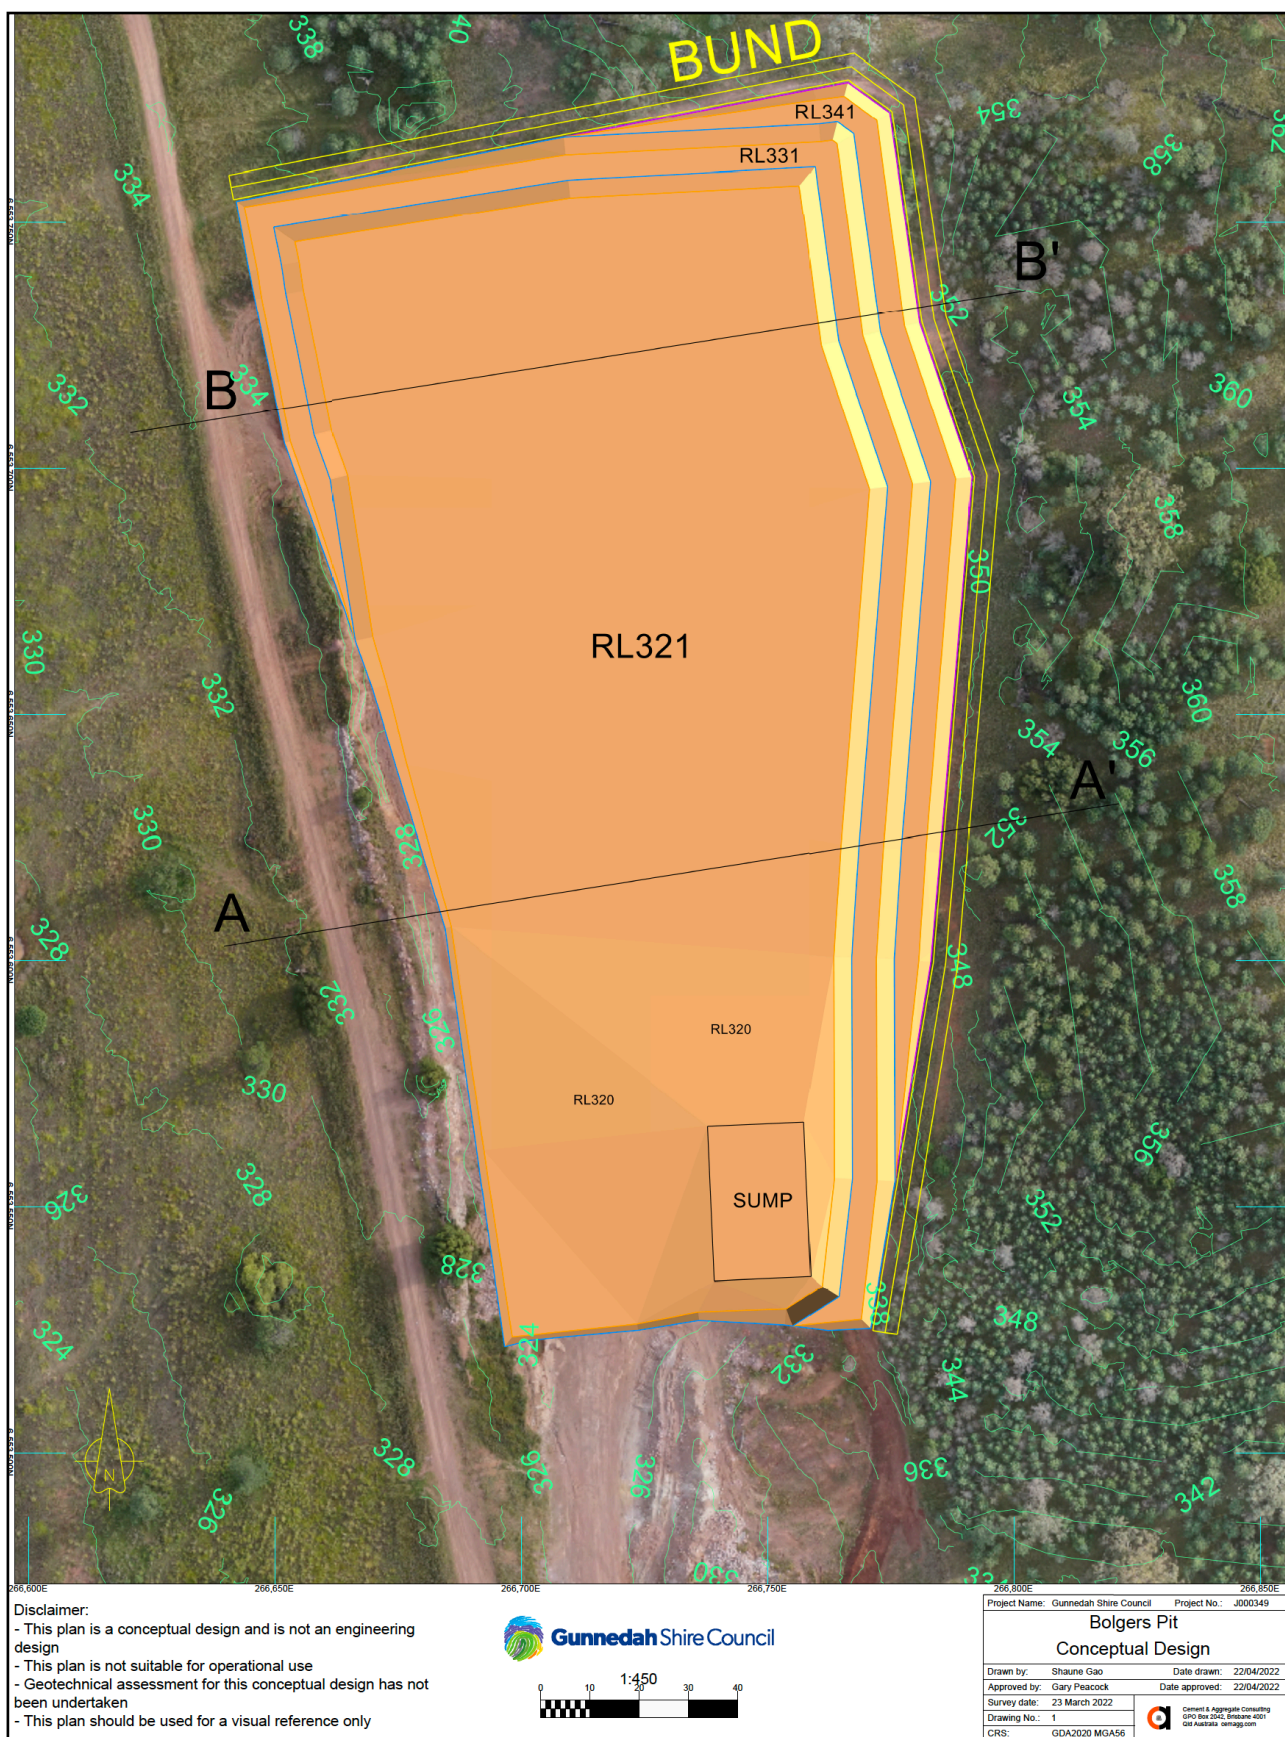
Proposed Quarry Extension: Bolgers Pit, showing cross-sections
